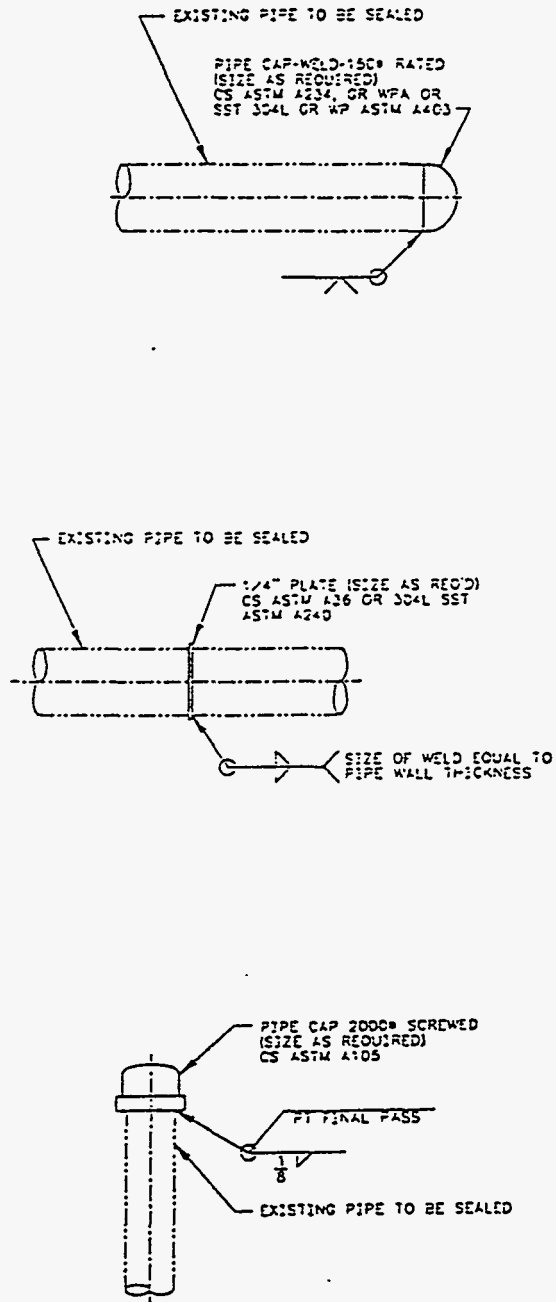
Typical Plugs for Floor Drains and Openings.
